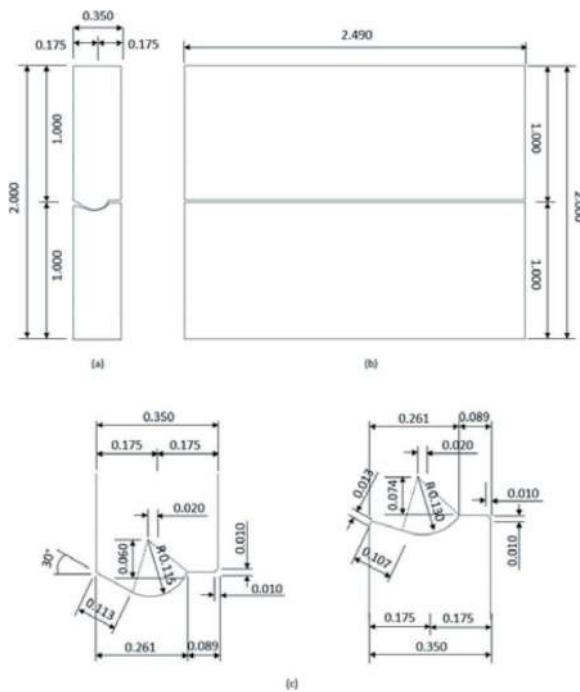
Geometry and dimensions of the test sample for type 1 (a) transversal section (b) Longitudinal elevation (c) detail of pin-joint for top panel (left) and bottom panel (right); unit in m.
